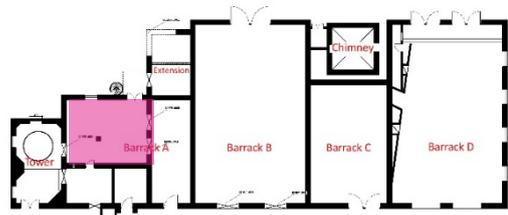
Prone to rust, Roof structure, Barrack A, 15 to 17A, East Wharf, KPT, Karachi.
